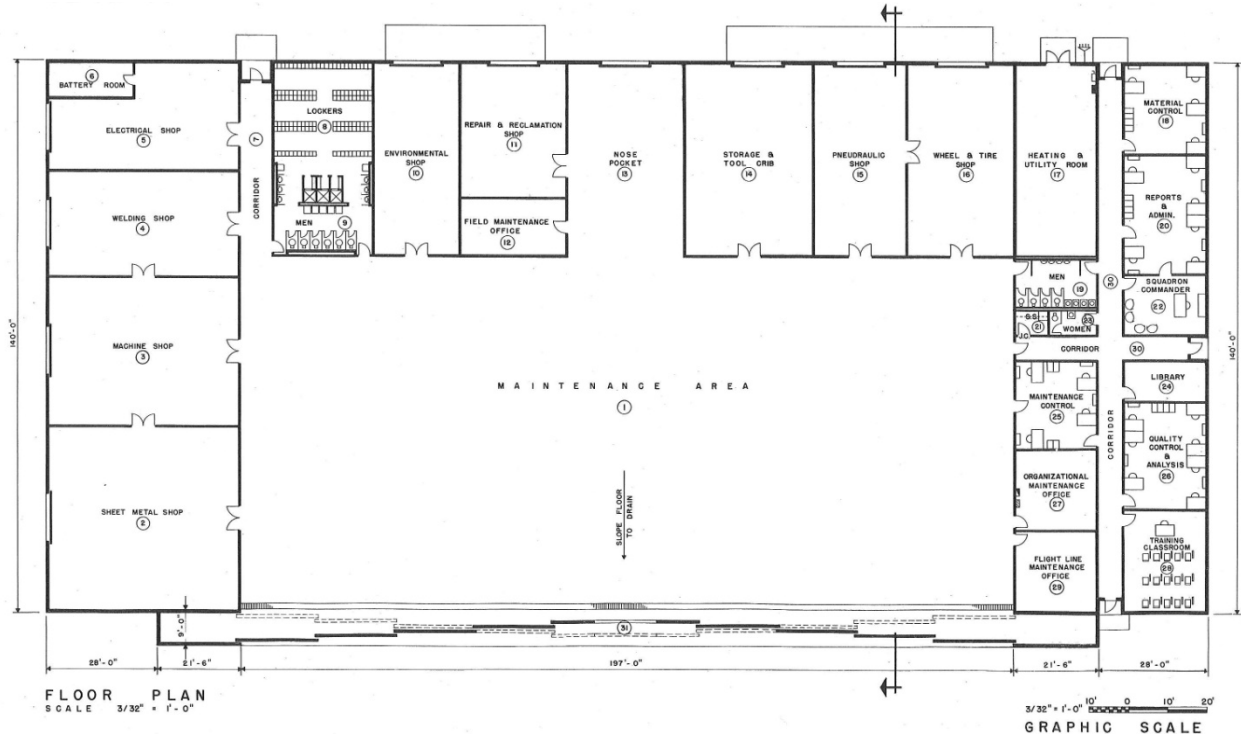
FLOOR PLAN OF DRAWING AD 39-01-65, 1956. AFM 88-2 1959.
